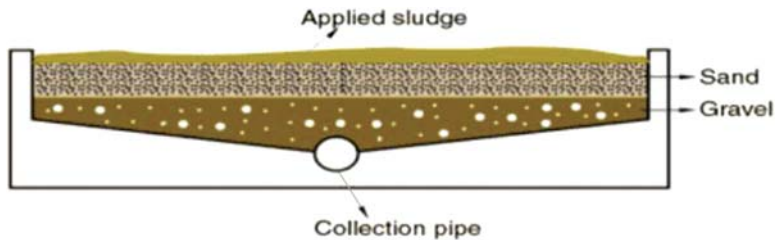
Cross section of a typical drying bed [Source: <http://www.unep.or.jp/ietc/publications/techpublications/techpub-15/2-5/5-5.asp> (2011)]
